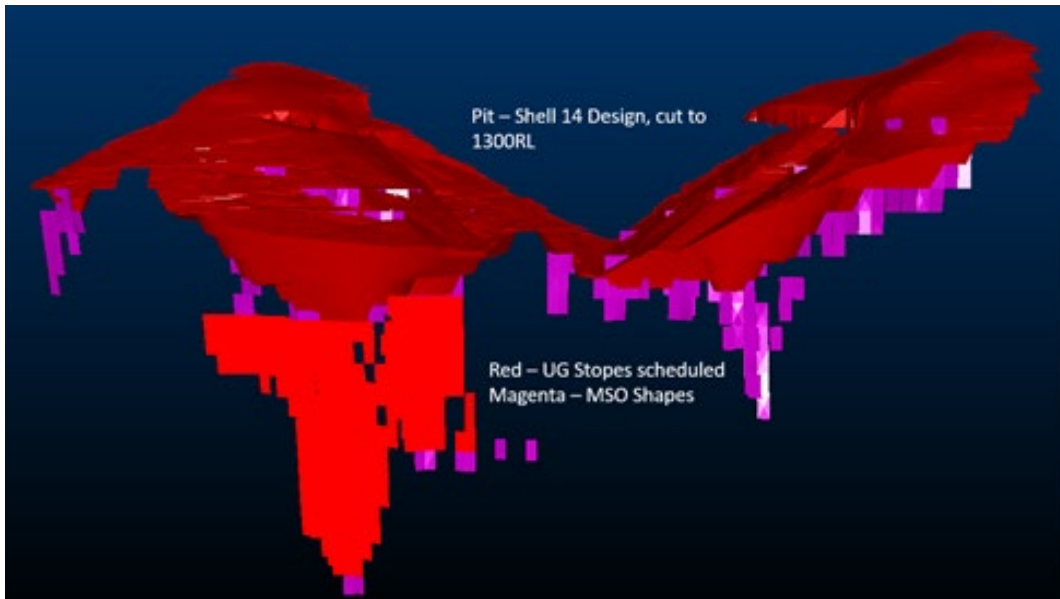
Open Pit design with underground design and underground optimisation shapes. Isometric looking West
